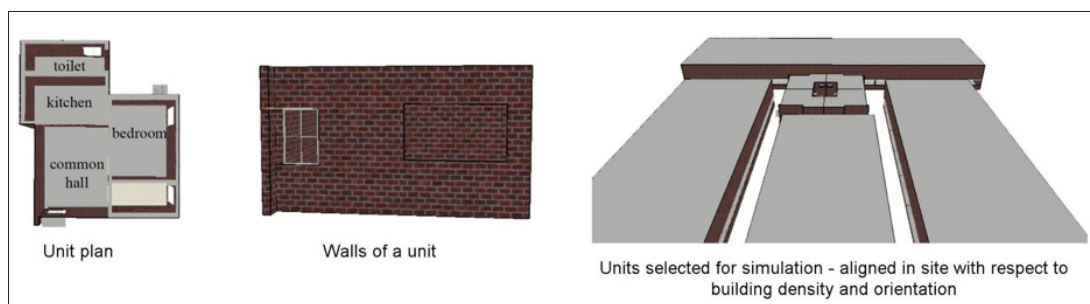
Model of Type 1 House after Changing the Building Materials Used to that of Type 2 House - Prepared for Indoor Thermal Comfort Simulation in DesignBuilder
